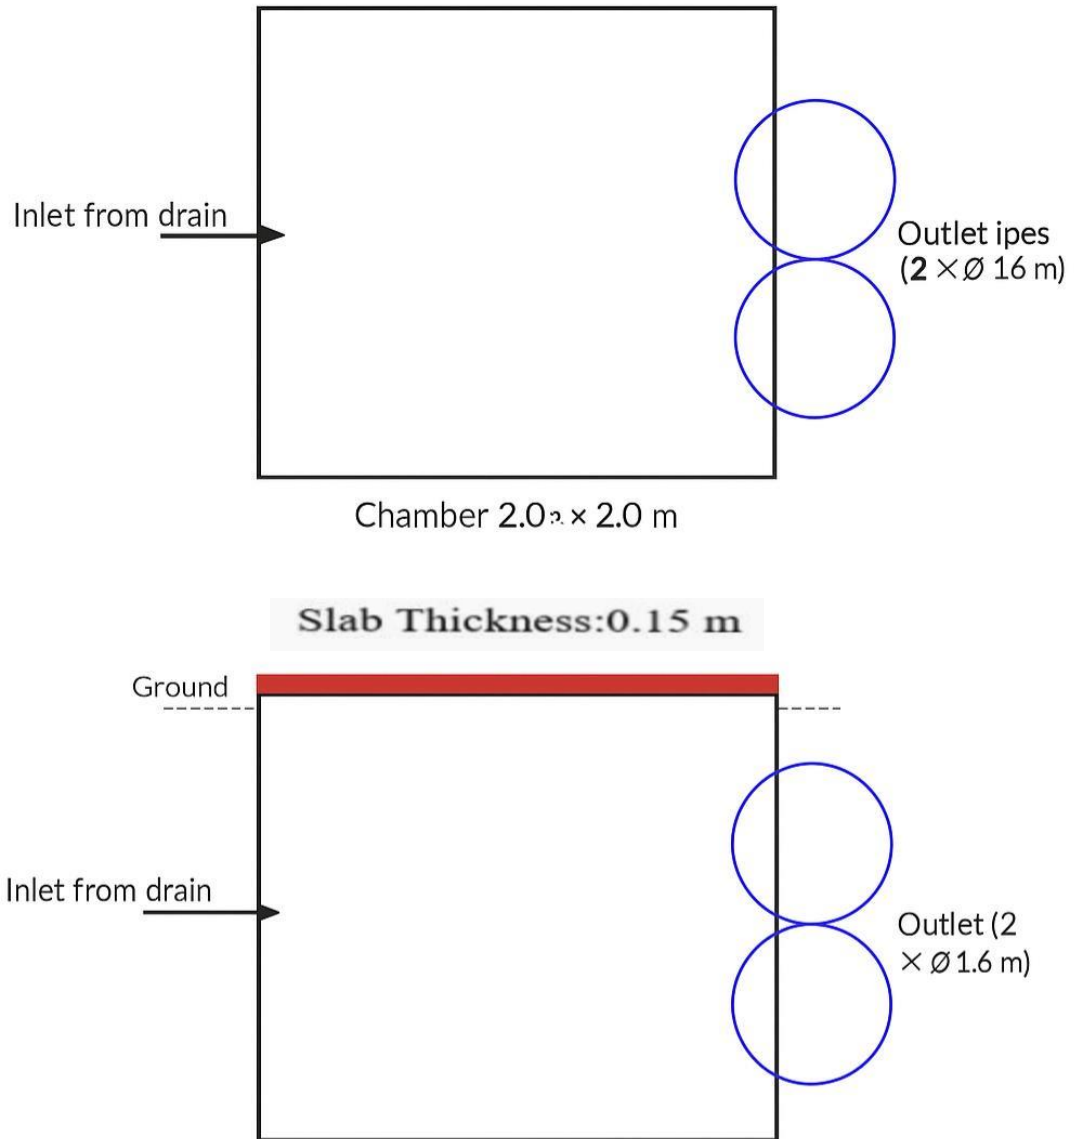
Plan and Section View of Proposed Manhole Chamber with Outlet Pipes
